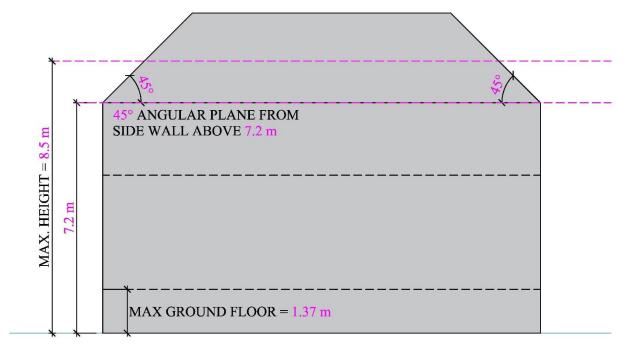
K.F9: Parallel Massing on Pitched Roof Building – Side Elevation
